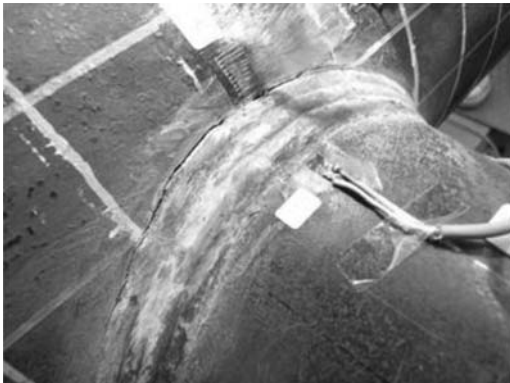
Fatigue crack at the chord weld toe – specimen T3.
